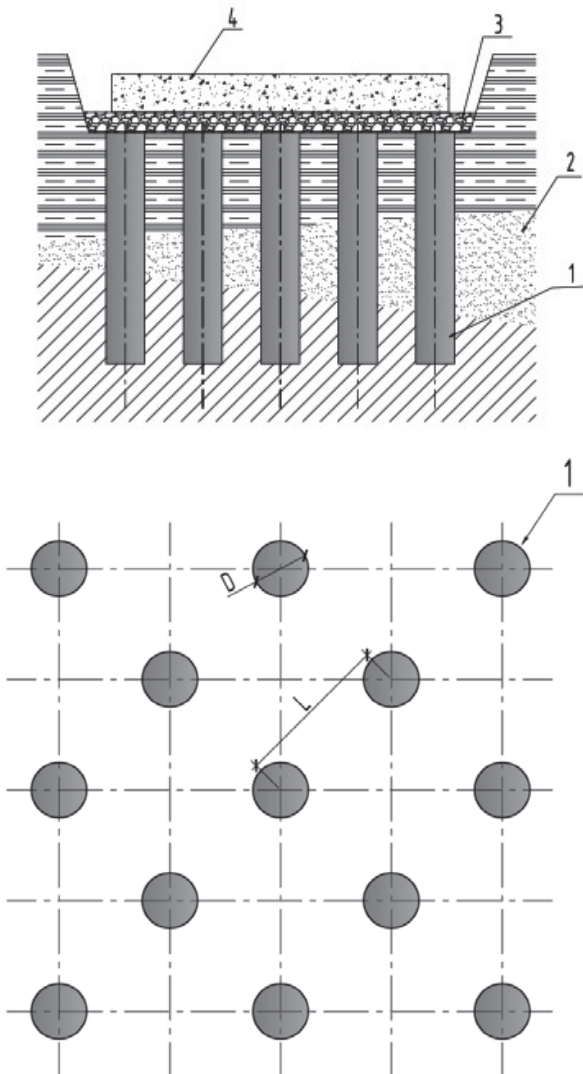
Construction of an artificial foundation "structural geotechnical solid"
